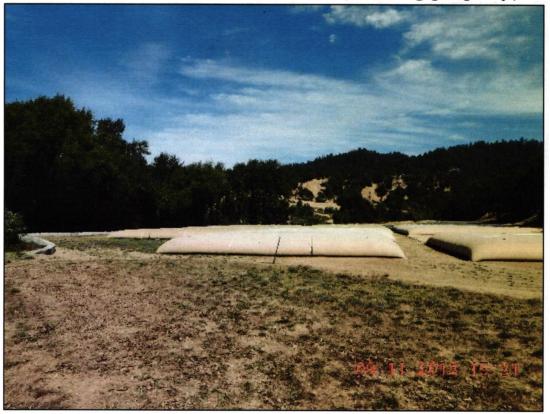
POS 1-14 - Bladders (210,000 gal. each)
